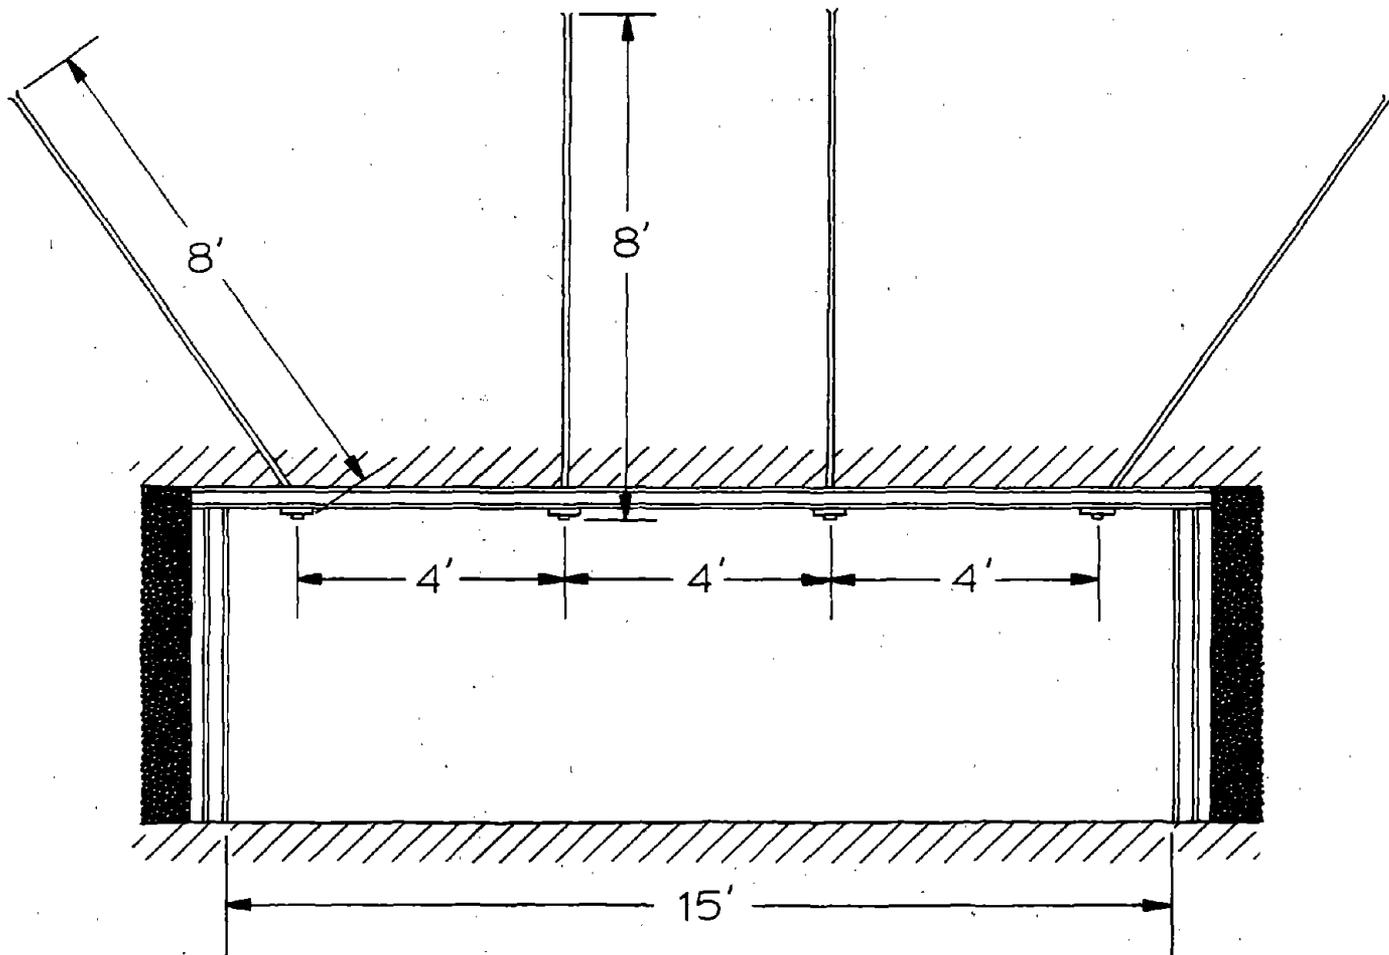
Recommended Fanned Resin Bolting Pattern
